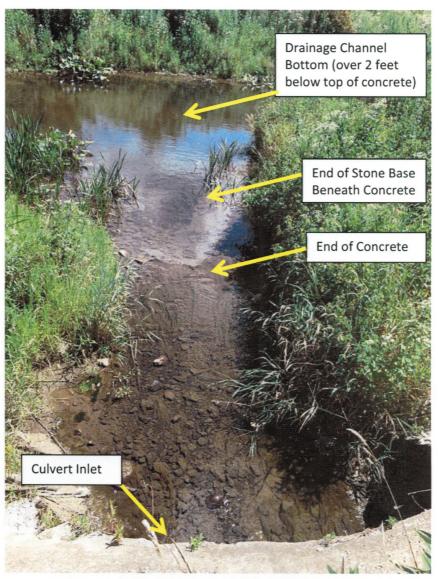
Inlet side (east side) of Sharp Rd culvert showing concrete and stone base placed more than 2 feet above channel bottom.
